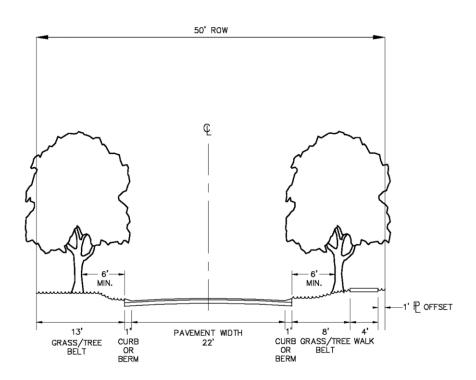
Local Access Street - No Parking Allowed (Single Loaded)
